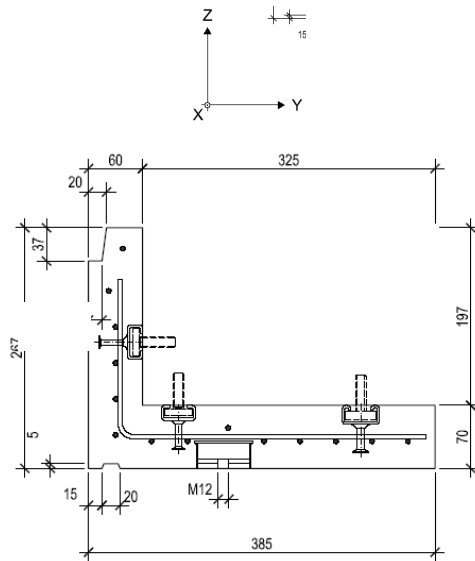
8.8 m long CFRP prestressed HPSCC façade beam with L cross-section 267 x 385 mm
